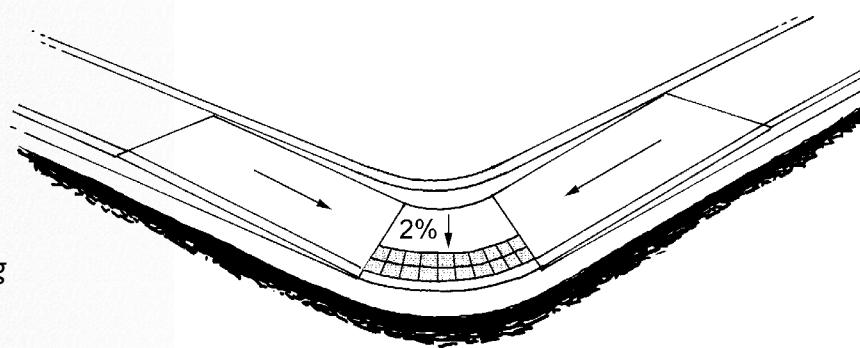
On narrow sidewalks with tight turning radii, a single parallel curb ramp may be considered.
